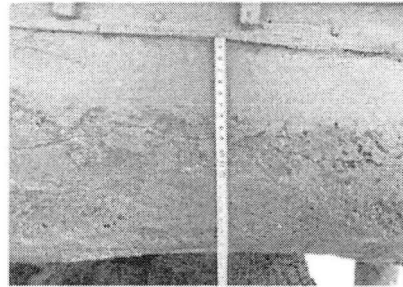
CONG. BEAM - GRID 1 BETWEEN F & G
